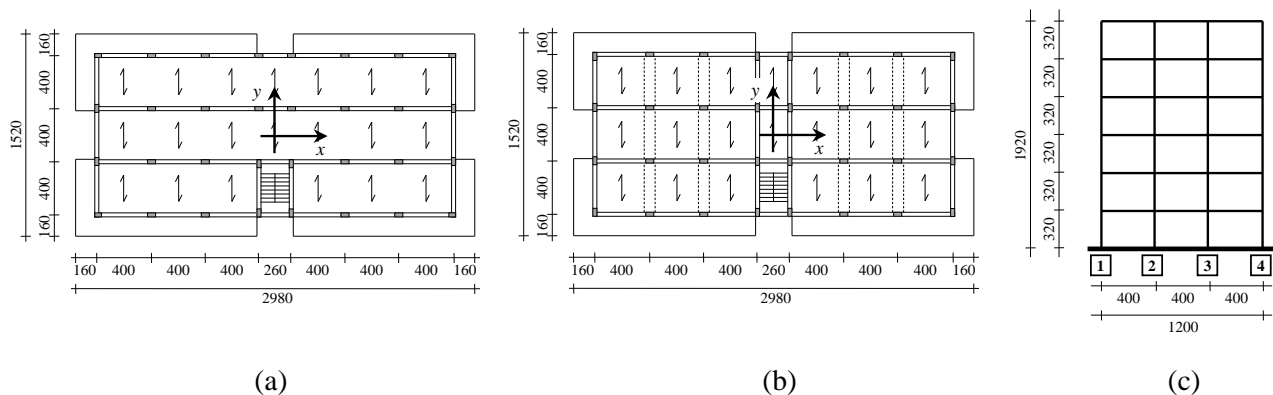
(a) Plan view of the GL buildings; (b) Plan view of the SR building; (c) Analyzed frame
